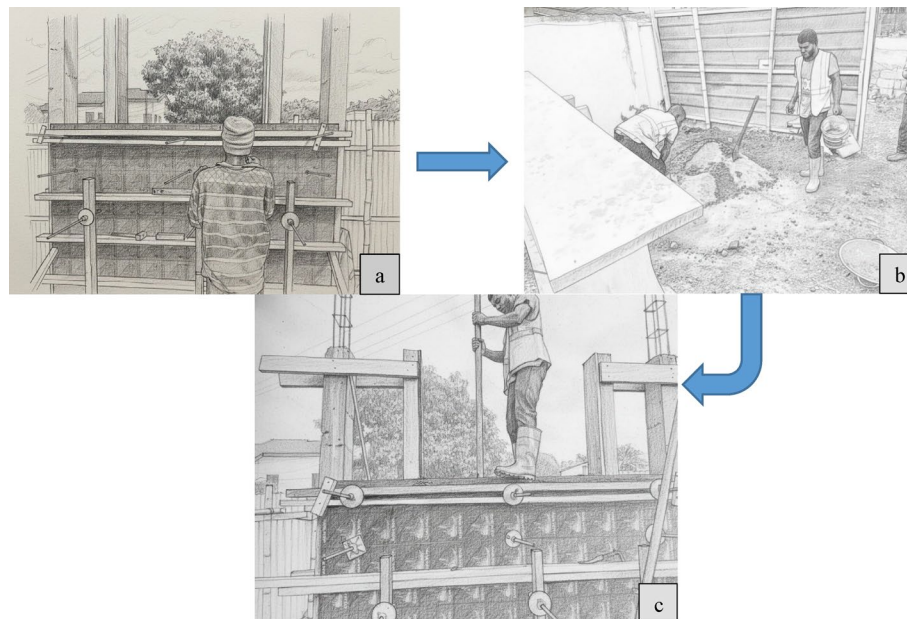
Key stages in the construction of RE wall at the Ghana Institution of Engineering, Accra in 2024. (a) Stage 1: On-site construction of timber formwork; (b) Stage 2: Preparation of stabilized soil aggregates; (c) Stage 3: Manual compaction of the mixture in 300 mm layers. Source: Authors (2025)
